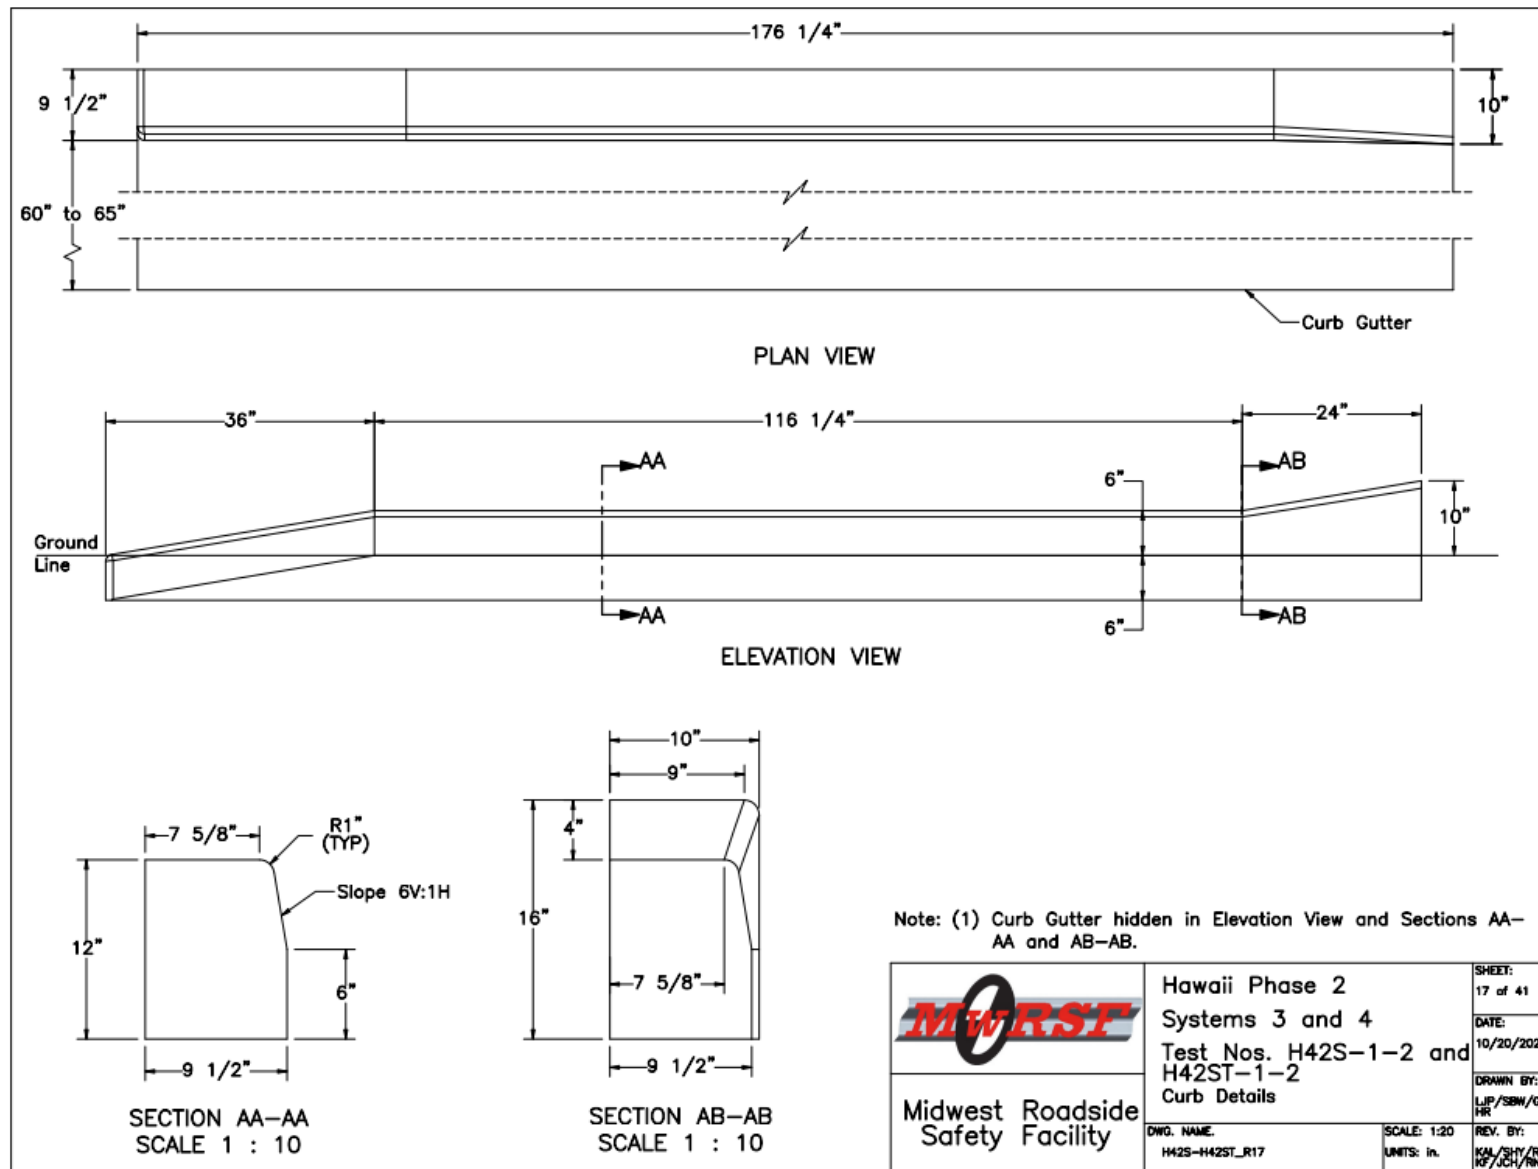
Curb Details, Test Nos. H42ST-1 and H42ST-2
